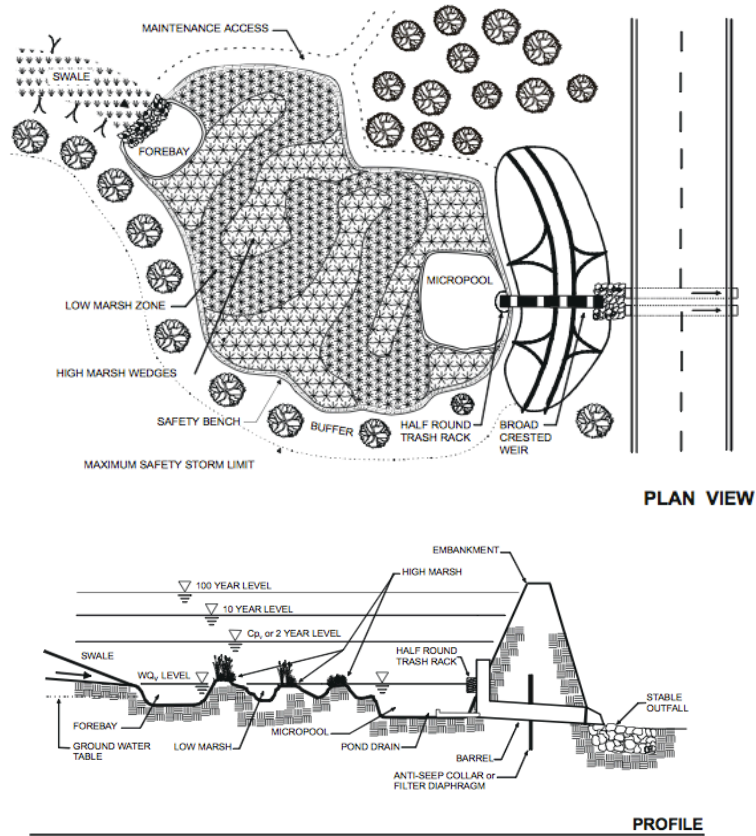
Pocket Wetland Plan and Section View (MDE, 2009)
